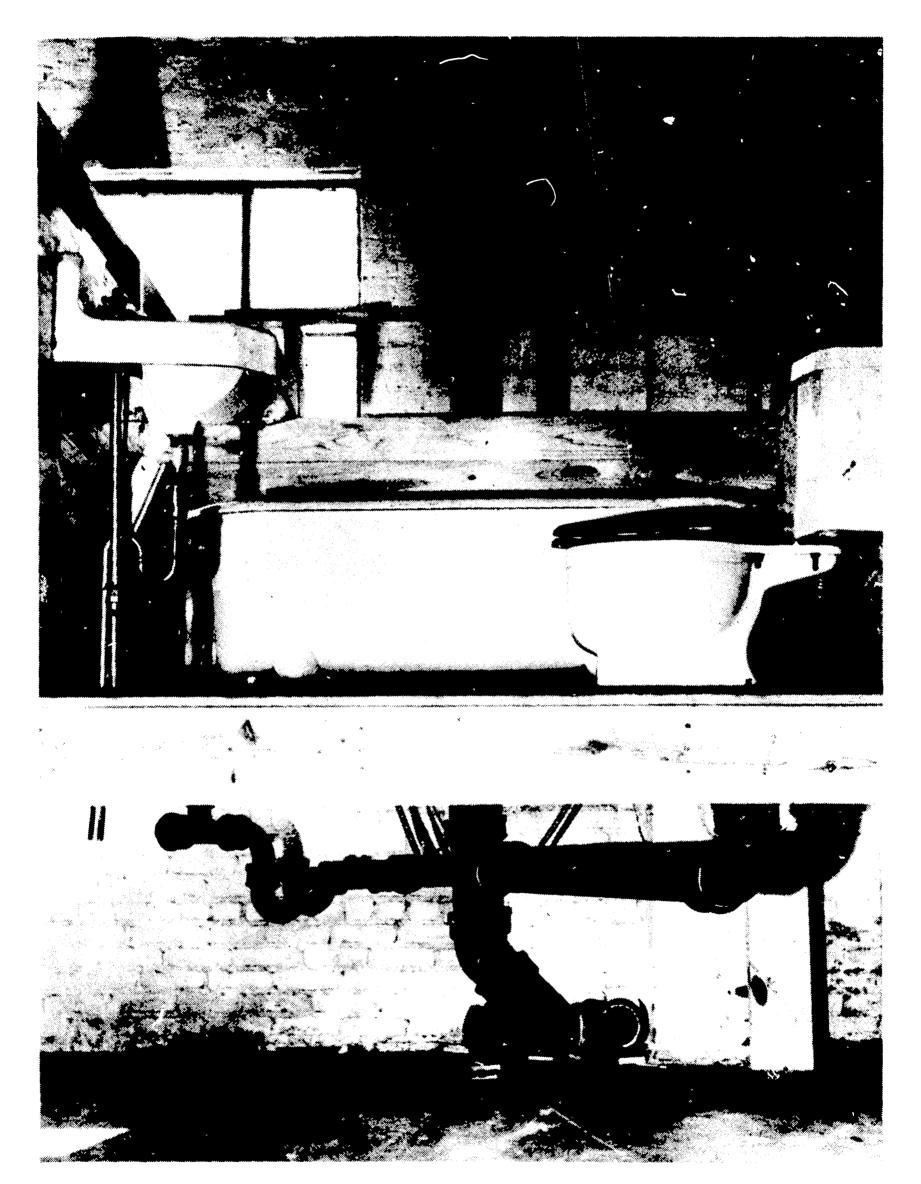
Close-up of bath room fixtures, cast-iron disposal pipes, and leaded joints. Bath room floor is of sufficient height to allow work room underneath.
